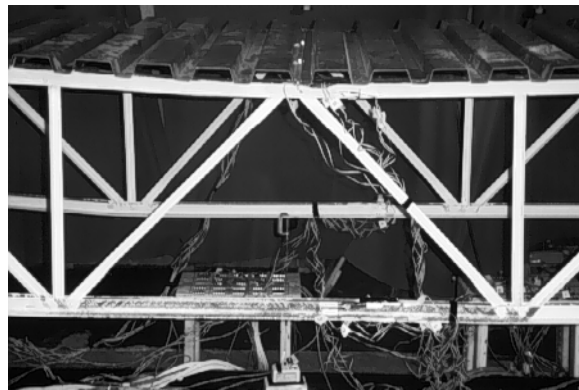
Failure Mode for 26K5-PW-1 West Joist
